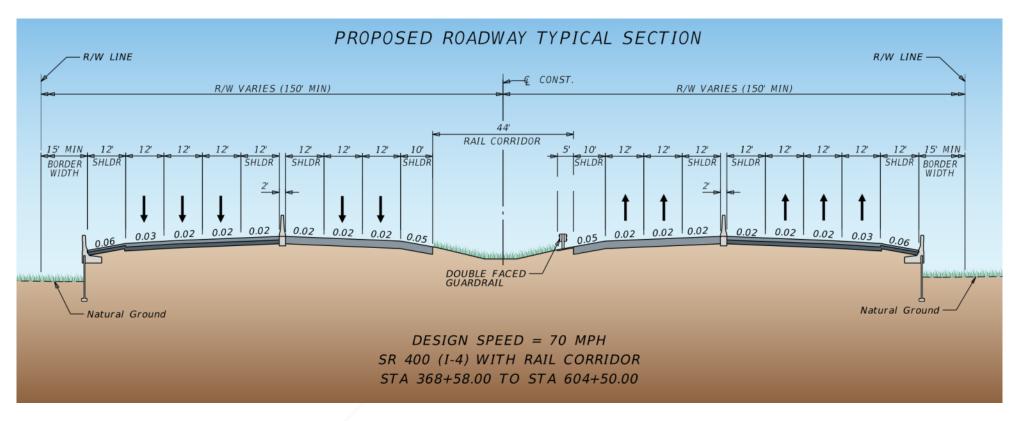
SR 400 (I -4) Segment 5 Proposed Typical Section (6+4 with rail corridor)
